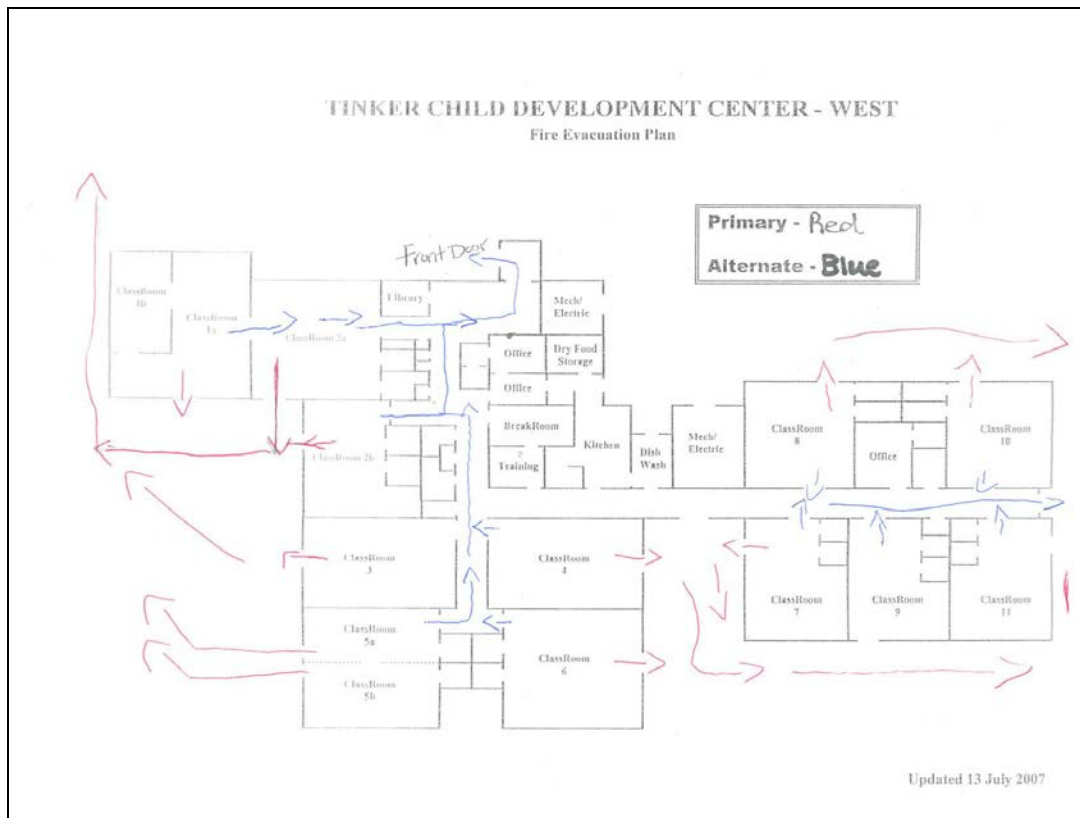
Evacuation Plan, CDC West, Building 5510
